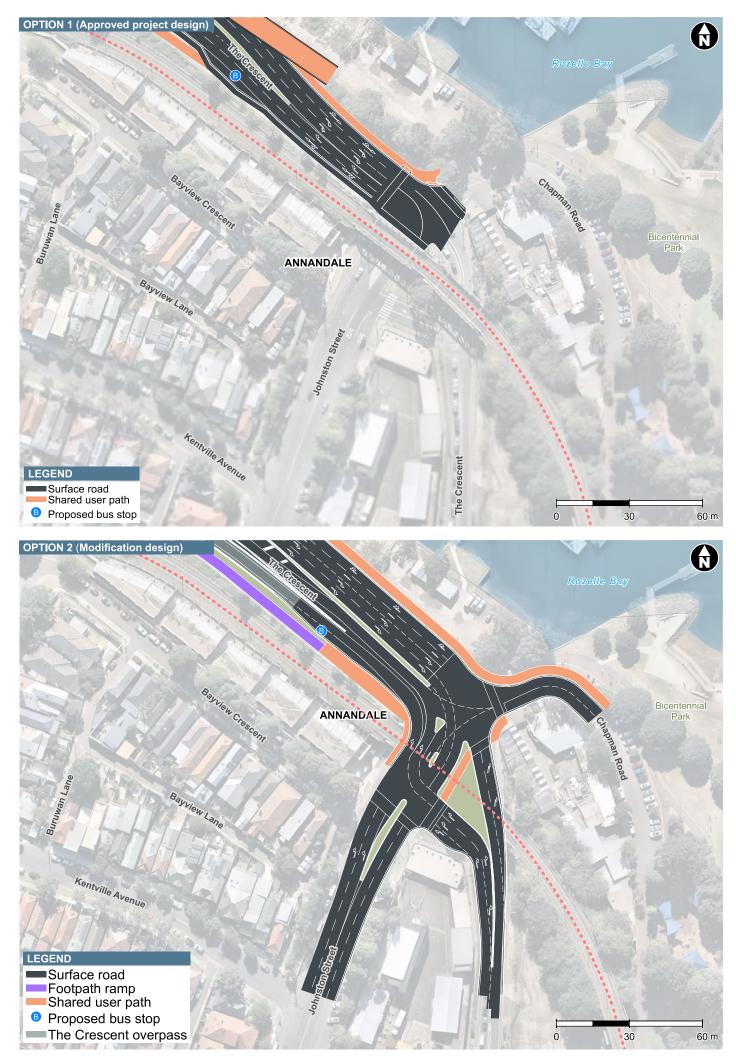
The Crescent, Johnston Street, Chapman Road intersection options
